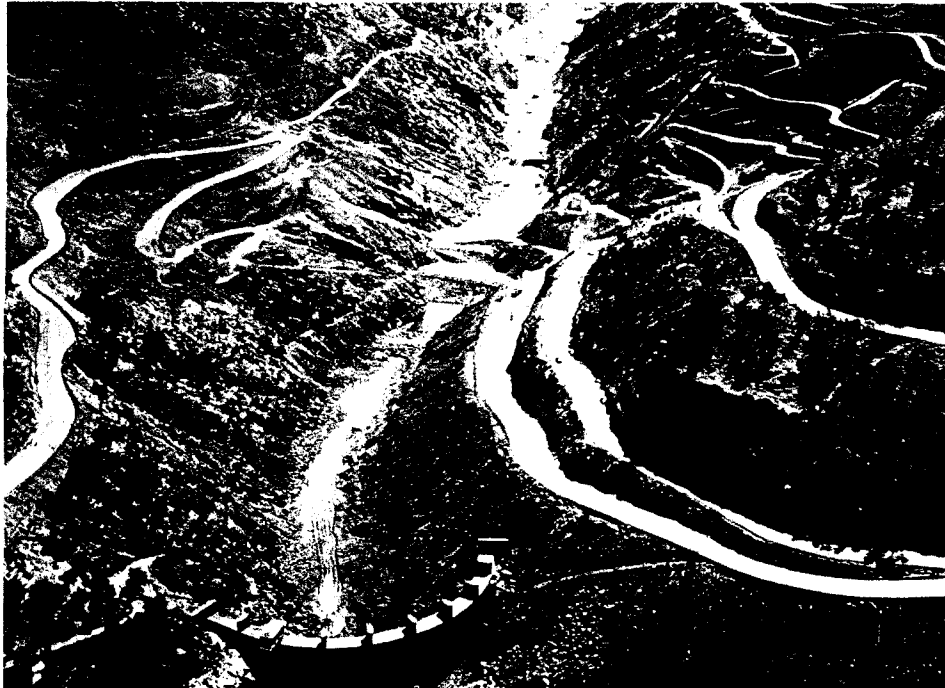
New Melones Dam construction phase. Photo illustrates access roads around the original Melones Dam (US Army Corps of Engineers 1973).
